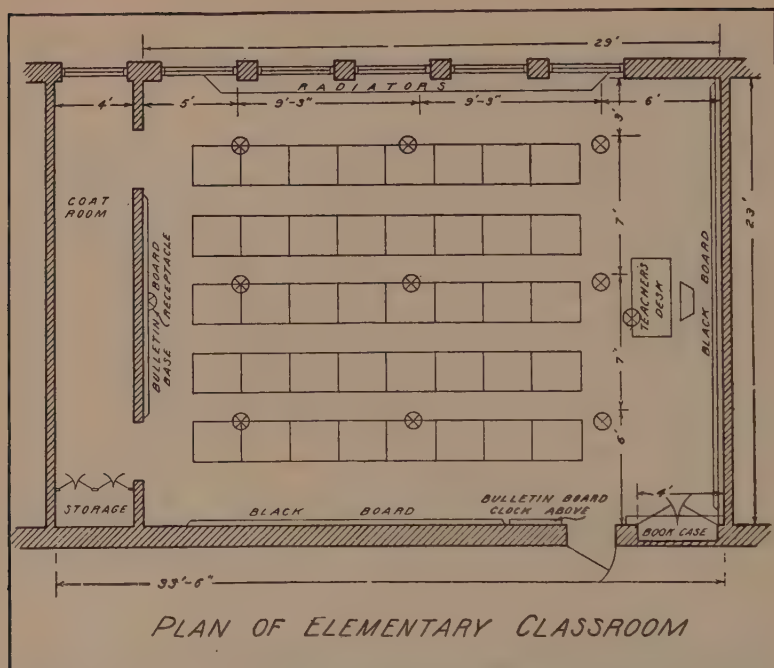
A study of this classroom plan may give helpful suggestions in construction and arrangement
